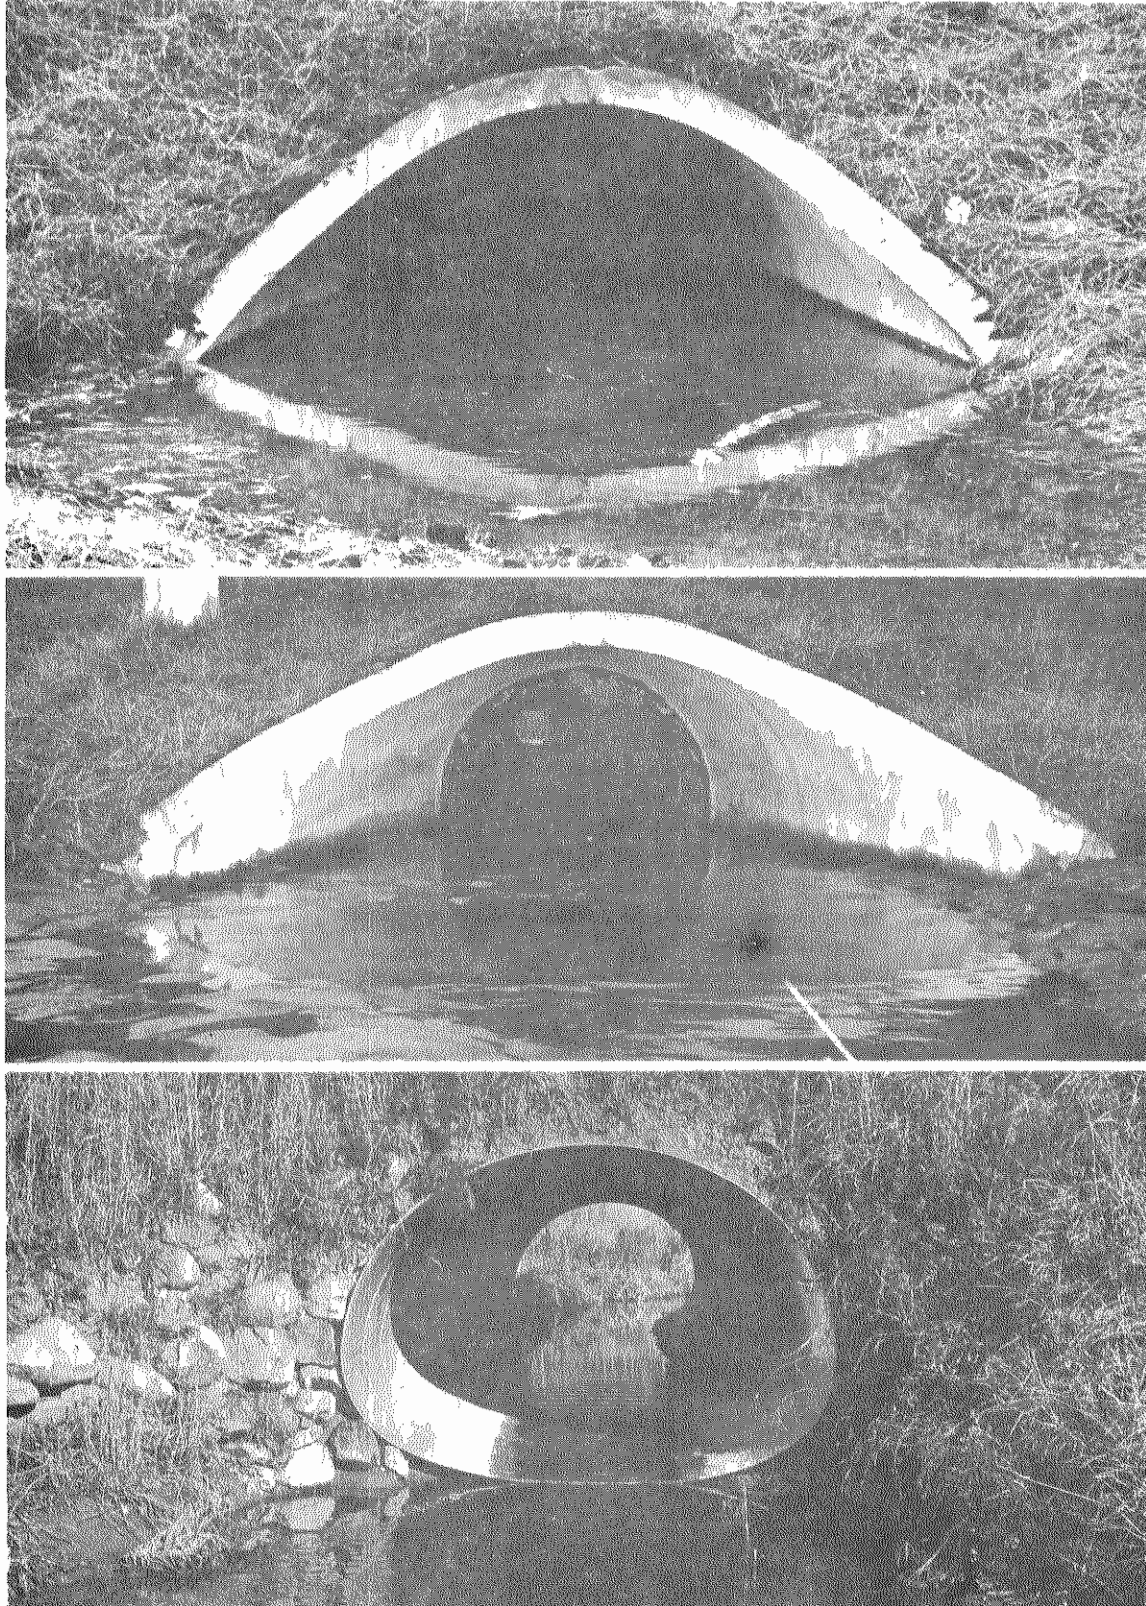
Drainage conditions for a US2 galvanized steel culvert (top: Sta. 96+00), a US2 aluminum culvert (center: Sta. 181+10), and the Ewen aluminum culvert (bottom).
